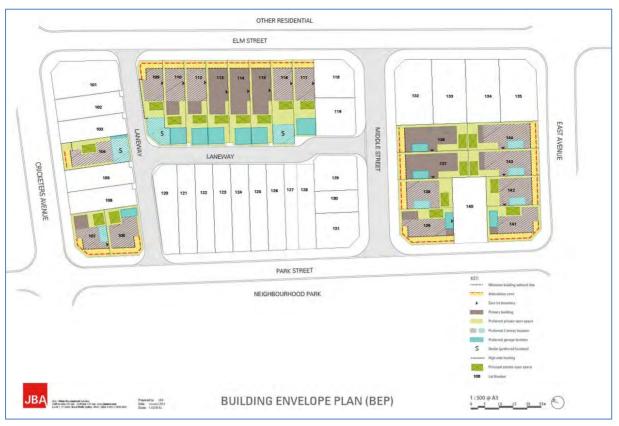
Sample of a Building Envelope Plan (BEP)
